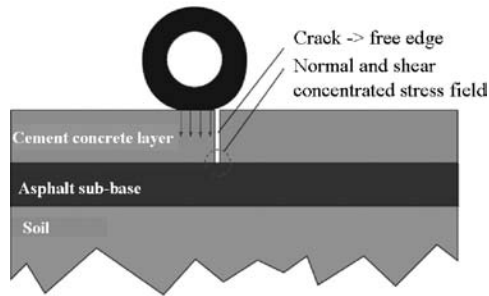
Location of stress singularities at the interface near a crack on a loaded composite pavement structure.
